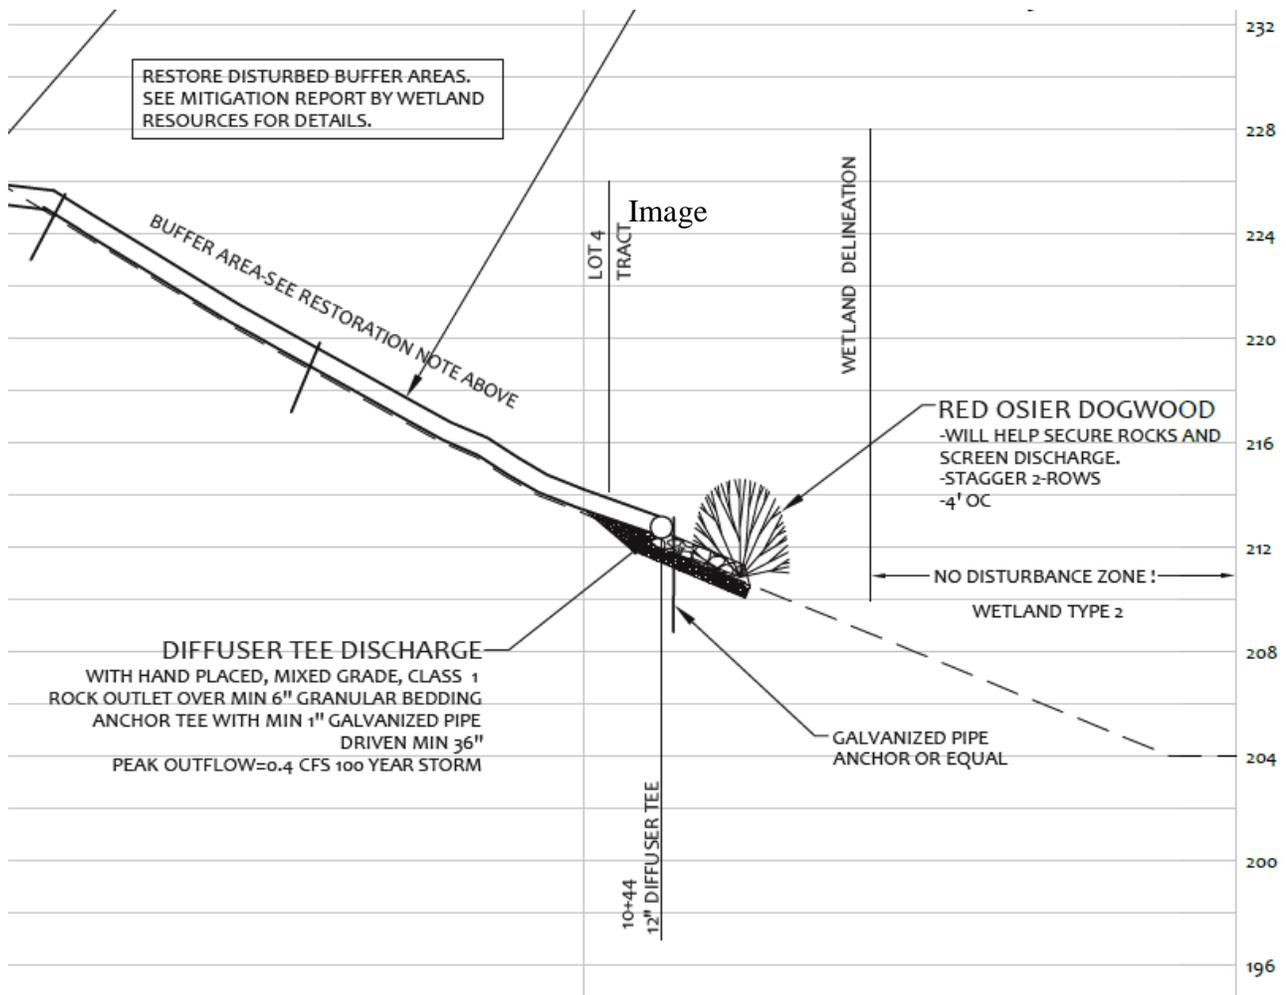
Example schematic of a biotechnical approach to outfall stabilization using cobbles and native shrubs.
